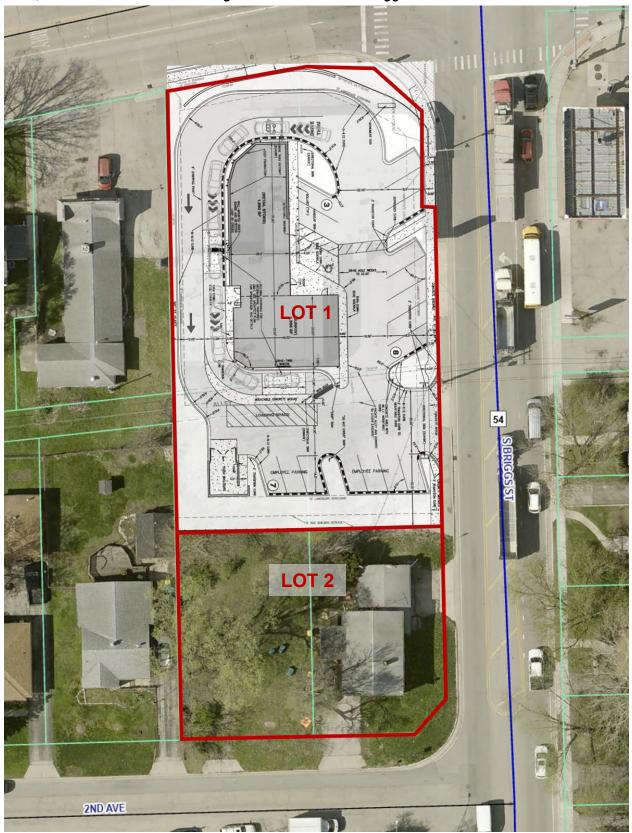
Requested perimeter landscape variations for the proposed development, to be reviewed by the Zoning Board of Appeals at their meeting on October 16, 2025
